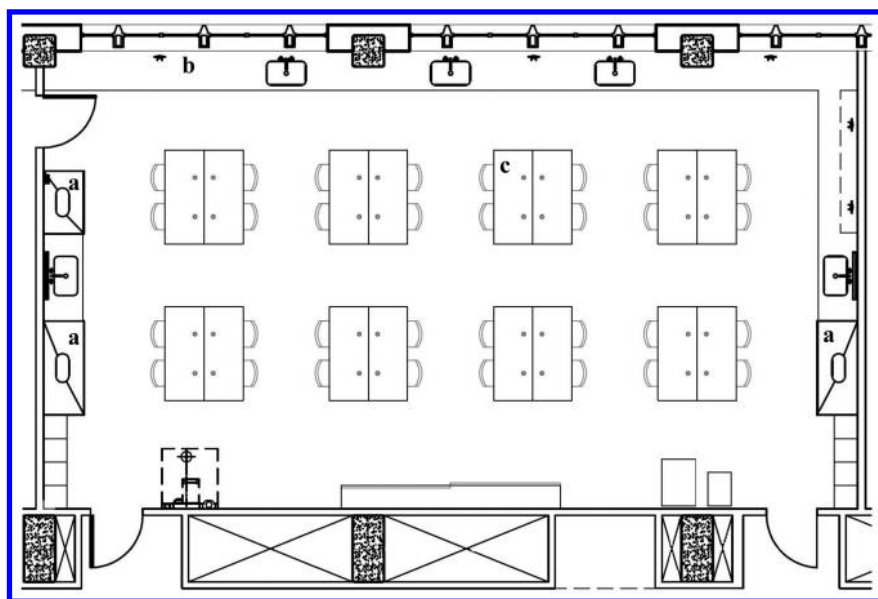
Laboratory layout for general chemistry. (a) Two six foot and one four foot hoods occupy interior walls, (b) exterior wall comprised of large windows and counter space for small equipment, and (c) moveable tables powered from floor boxes occupy the interior.
